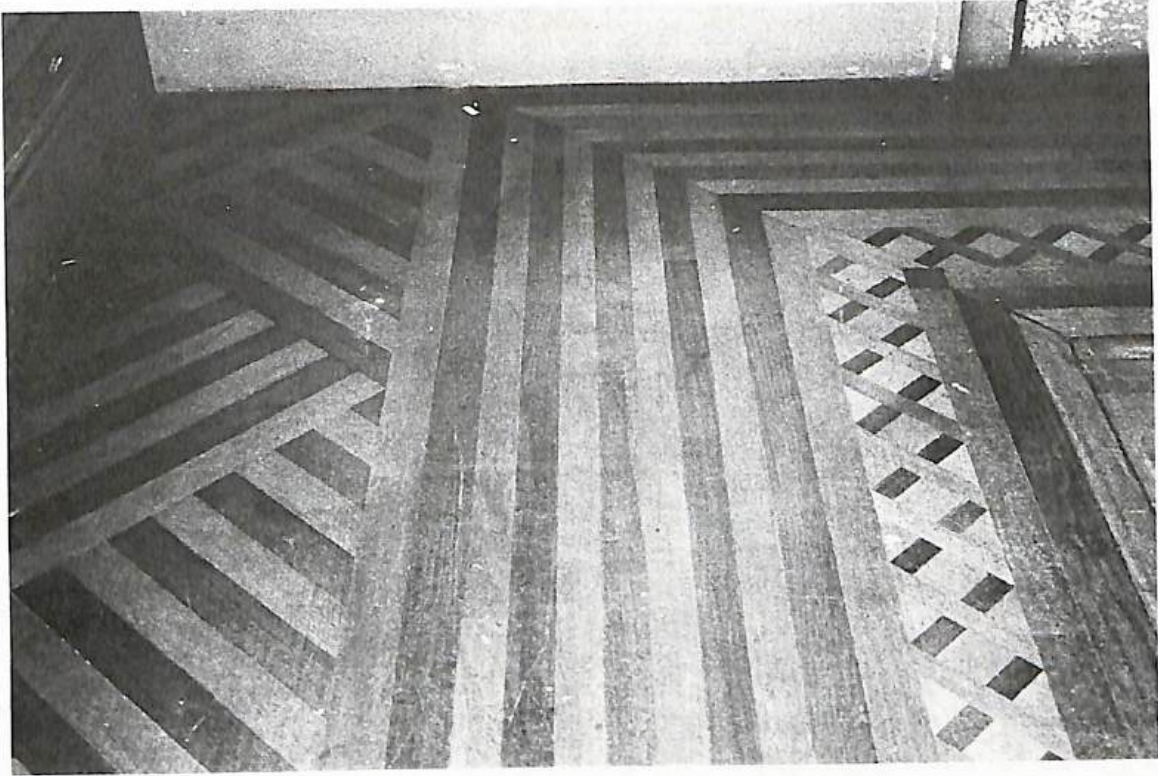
Parquet Floor: Bedroom 1, 1989. (PSD)
